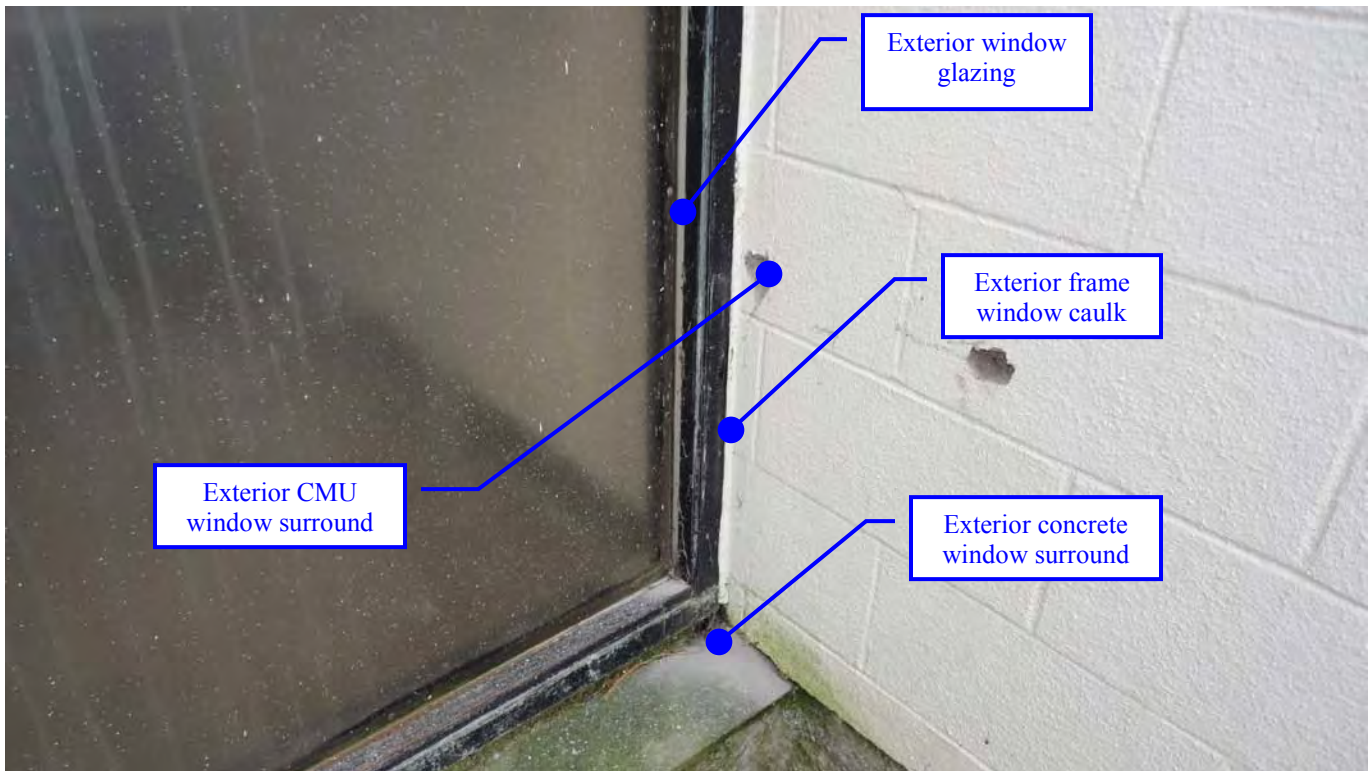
Typical corner classroom exterior window frame caulk (vertical joint) and window glazing (white).
